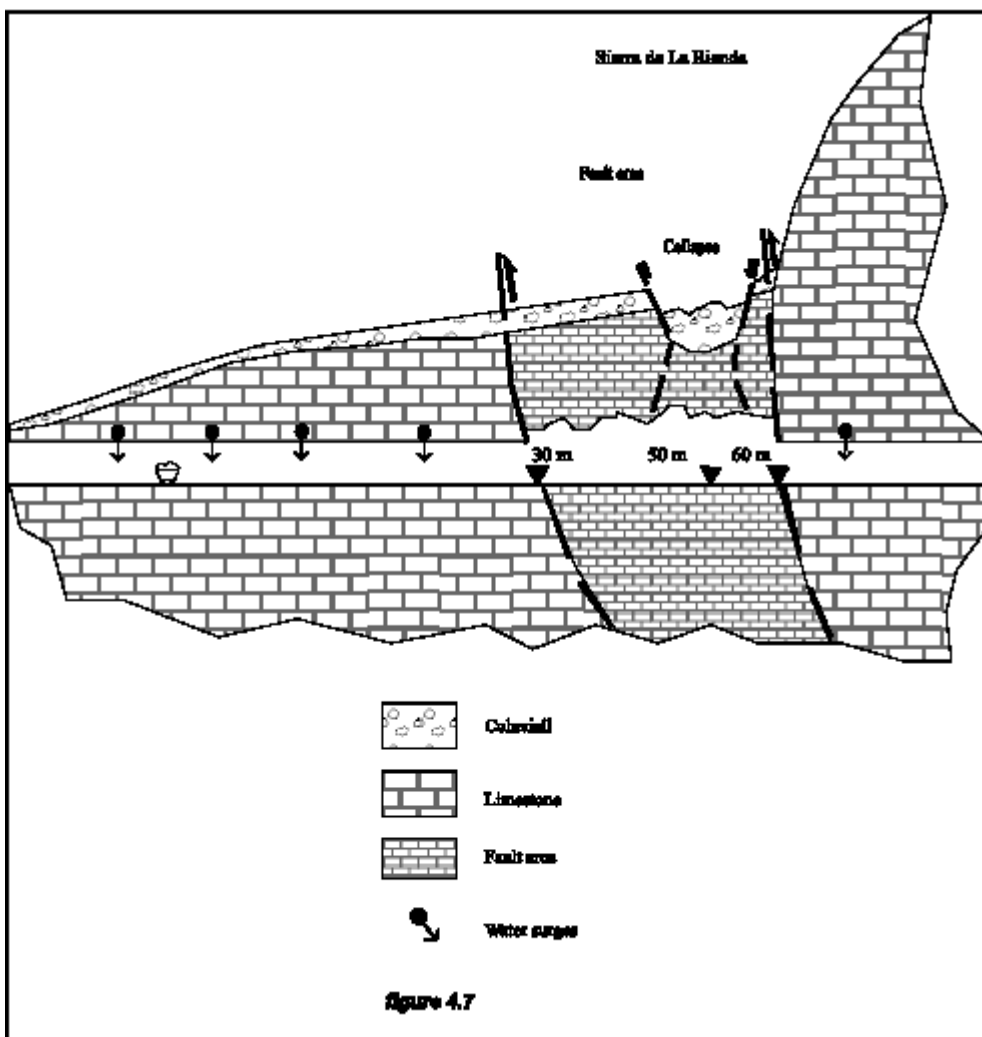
A thrust fault, present in the La Rienda tunnel
